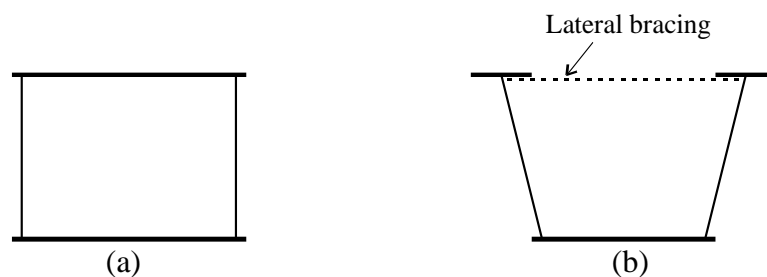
Steel box girders: (a) Enclosed box girder; (b) Tub girder with lateral bracing (quasi-closed box girder)
